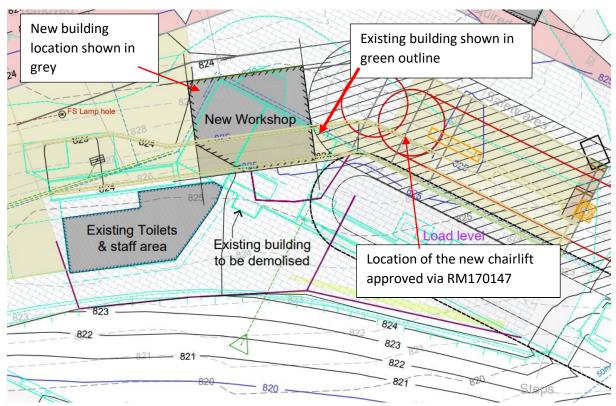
Proposed location of the new workshop building in comparison with the existing terminal/workshop building.
